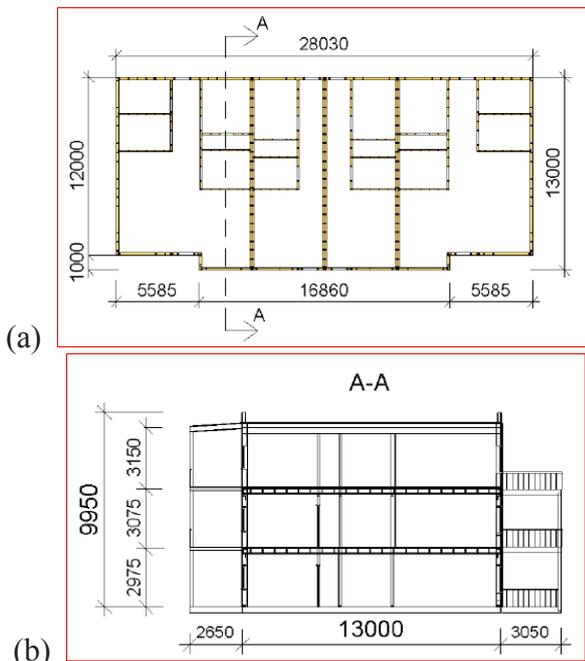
Plan (a) and cross-section (b) of considered three-storey building [8].
